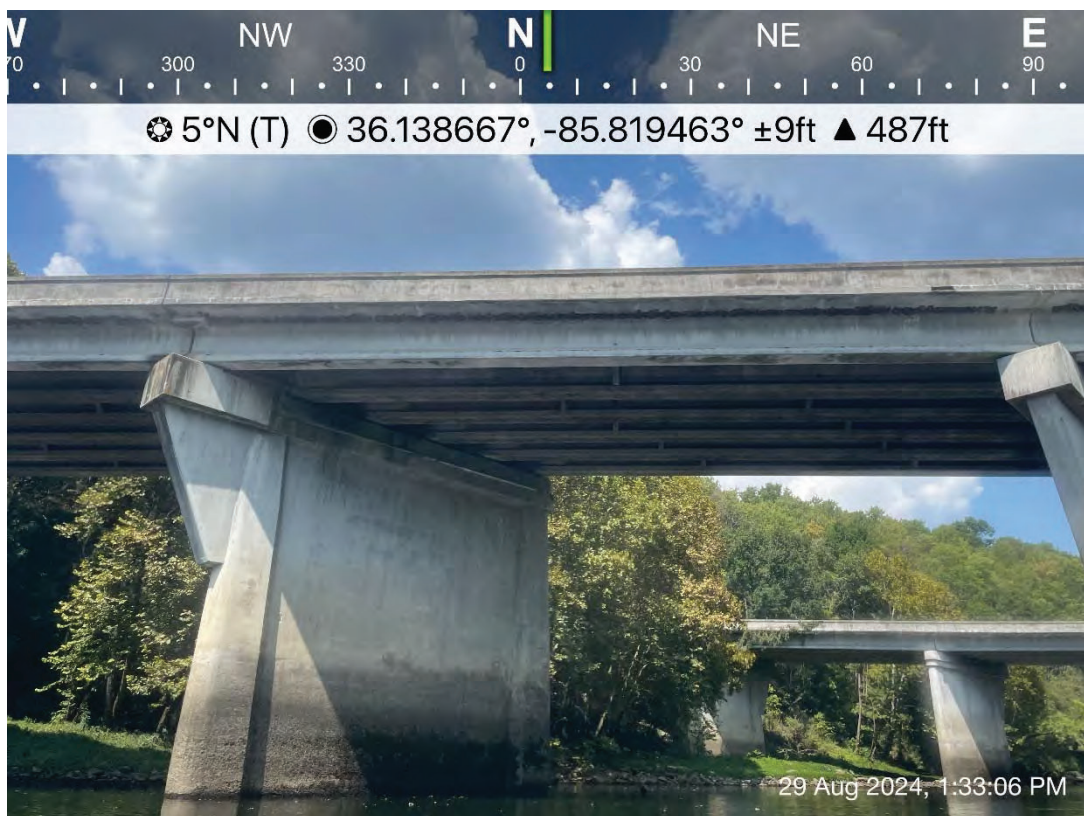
Swallows' nests on EB I-40 bridge over STR-1 (Caney Fork River) at LM 16.20
